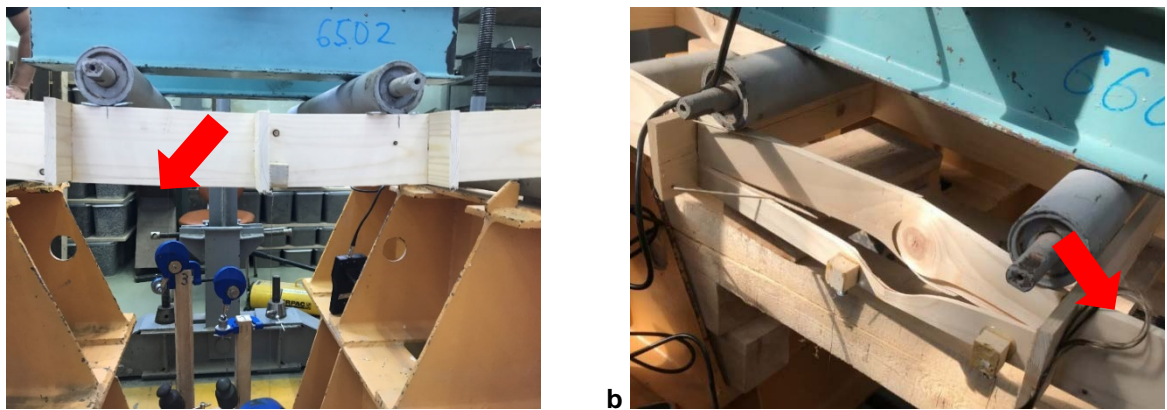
Crack in the bottom of frame (a), and teared reinforcement material (b), demonstrated by red arrow.
